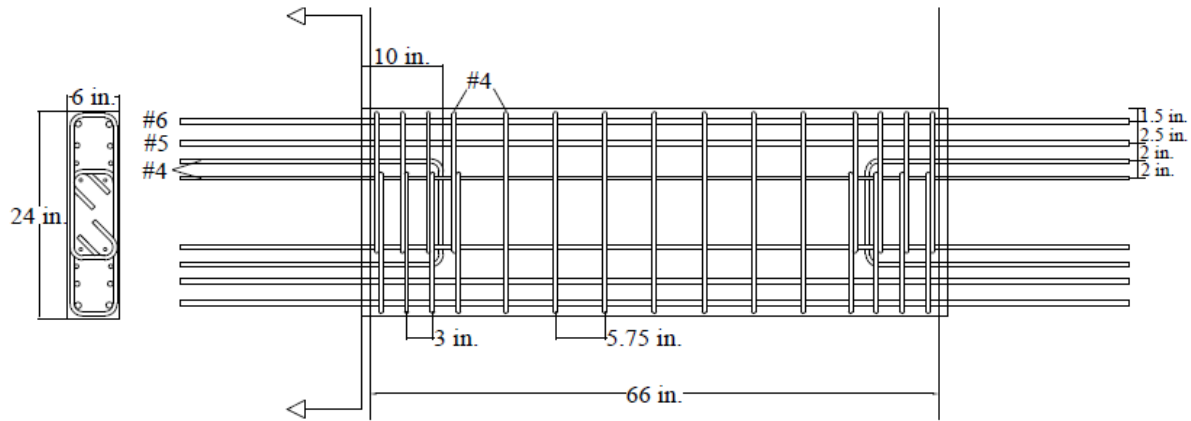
Reinforcement detailing for CB-6 (adapted from Setkit, 2012)
